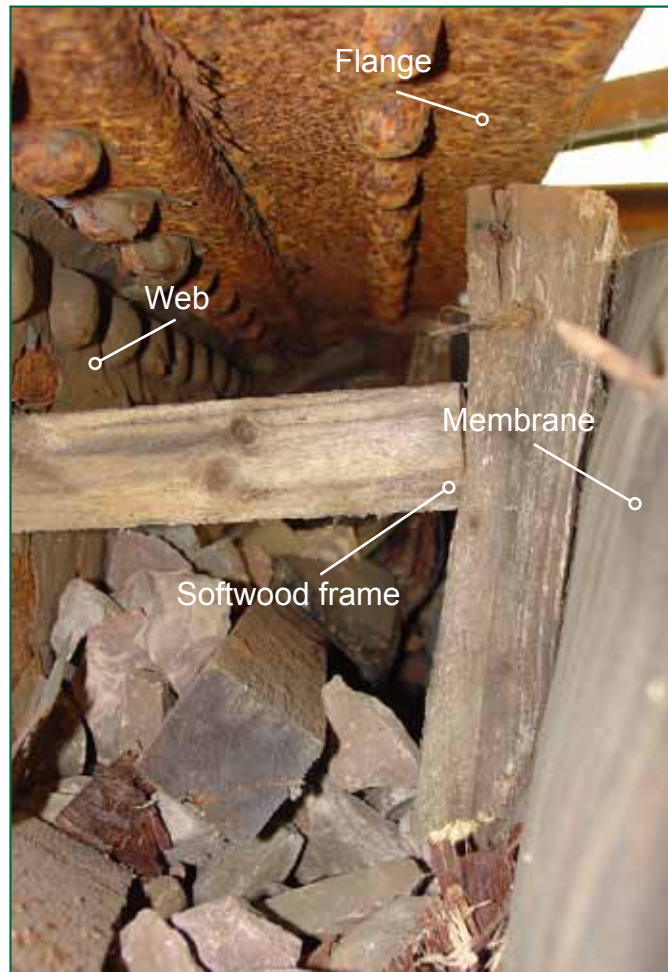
Accumulated ballast and debris found behind the waterproof membrane of the centre main girder
